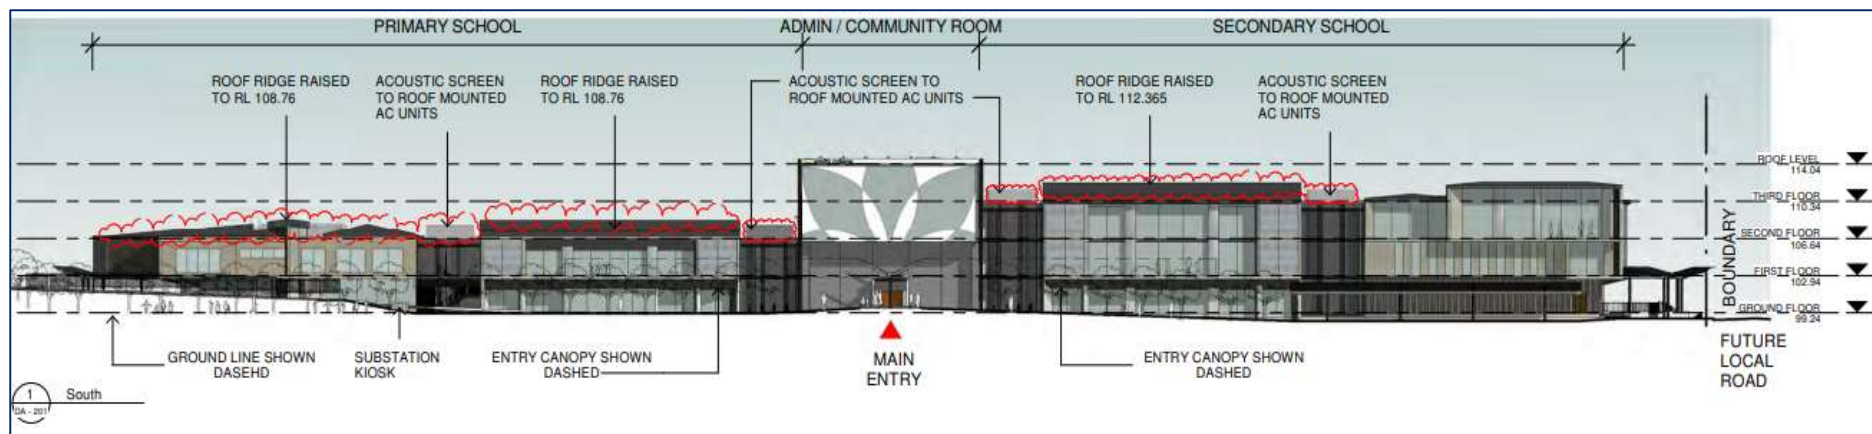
| Proposed roof ridge amendments and visual and acoustic screening (Source: Modification Application)
